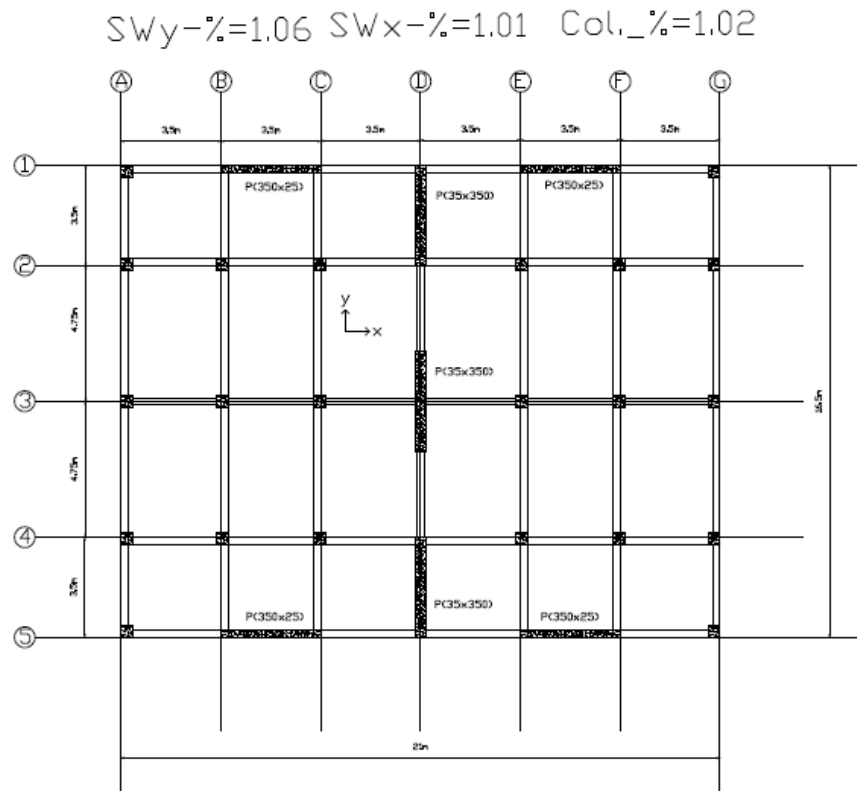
Plan of Model 24 with Different Wall Configuration and 1.0% Wall Area to Floor Area Ratio in Each Direction
